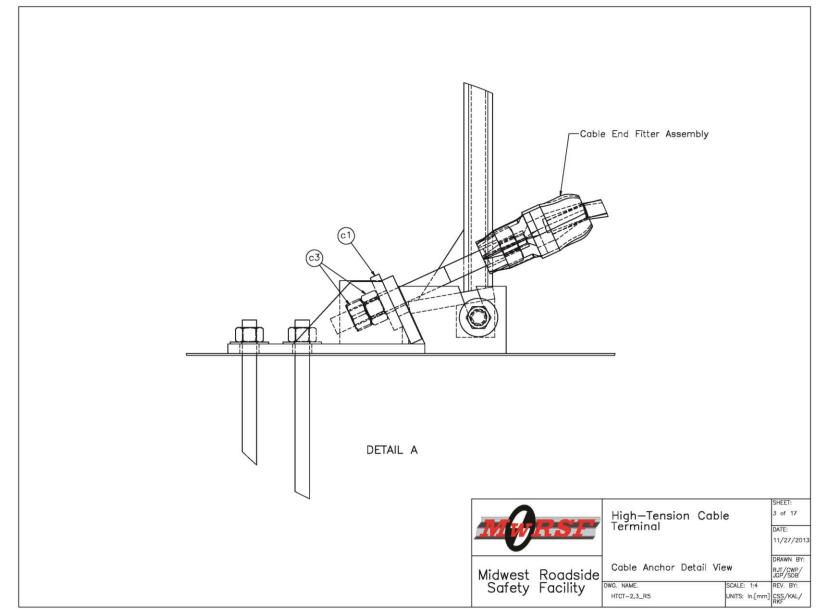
Cable Anchor Assembly Detail View, Test Nos. HTCT-2 and HTCT-3
